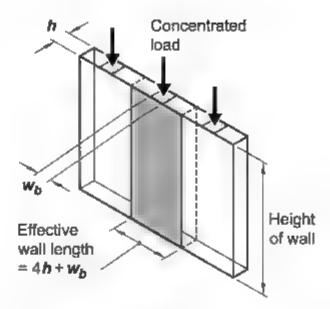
Portion of wall considered effective in resisting axial load
